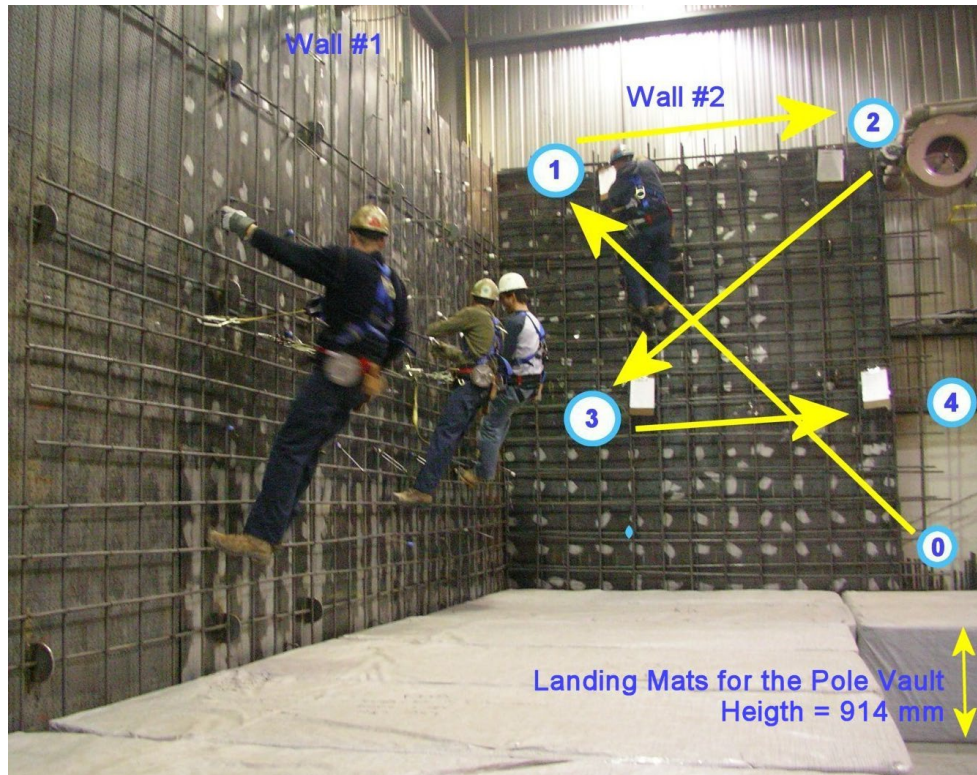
Wall no.1 and wall no.2. Wall no.1: installation of horizontal rebars. Wall no.2: displacements between 4 stations.
